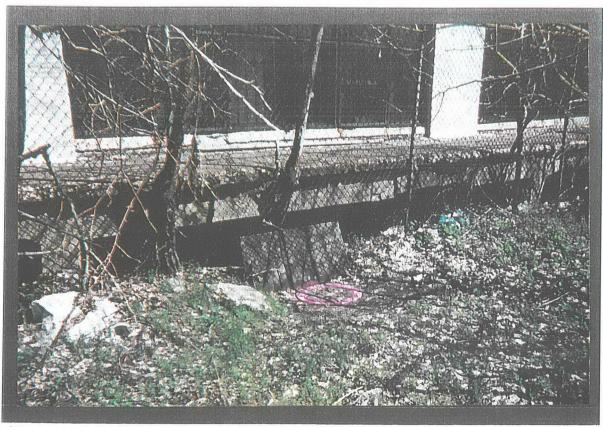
Facing west. Sewer line is adjacent to the loading dock. Trash pile in the back.
